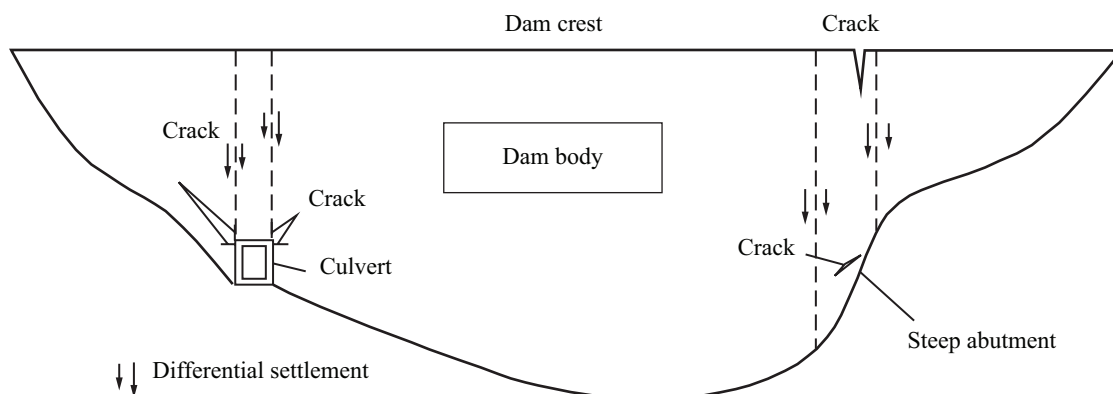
Longitudinal section of the dam — formation of low stress zones and cracks in the vicinity of the conduit and bund in the embankment dam
